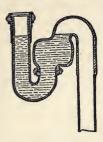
A water trap. Why does the water prevent sewer gas entering the house?
